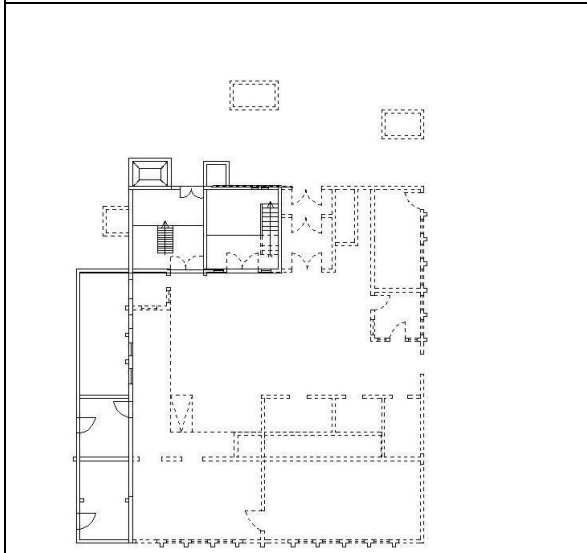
Schematic First Floor Original Plan of Zeyko Factory, Kyrenia
